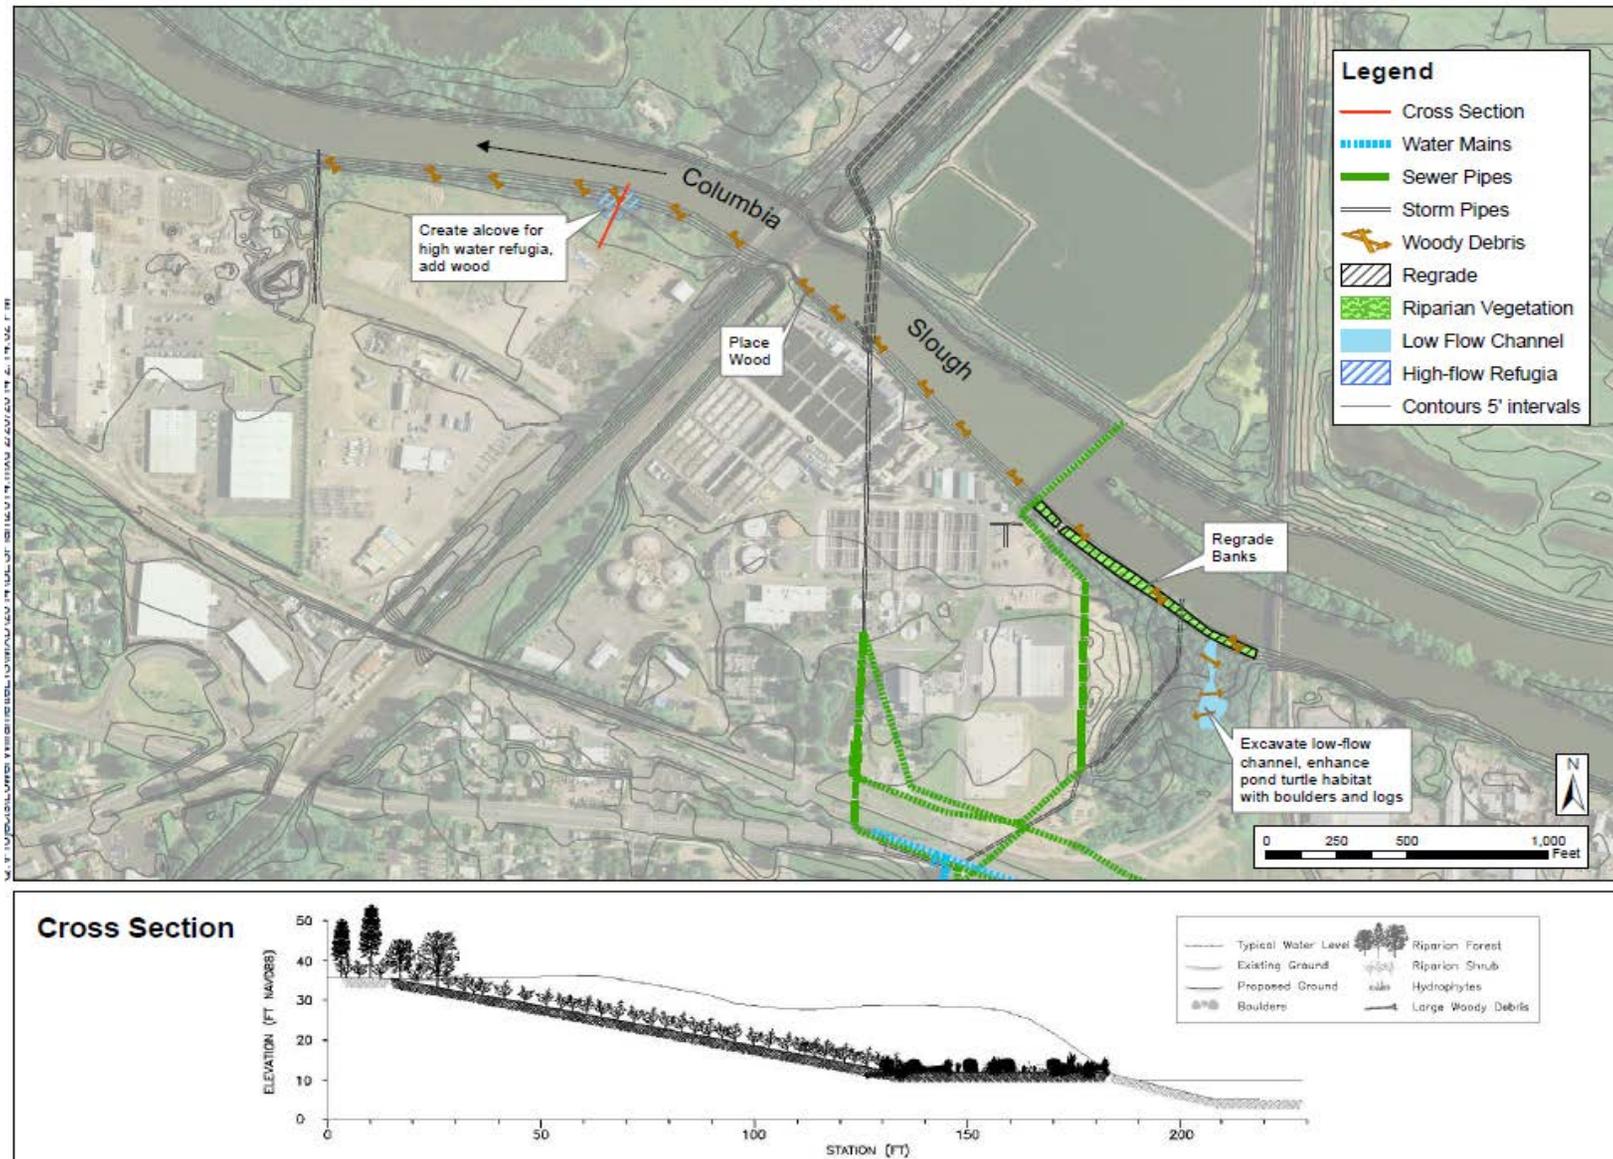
BES Plant Conceptual Restoration Plan
